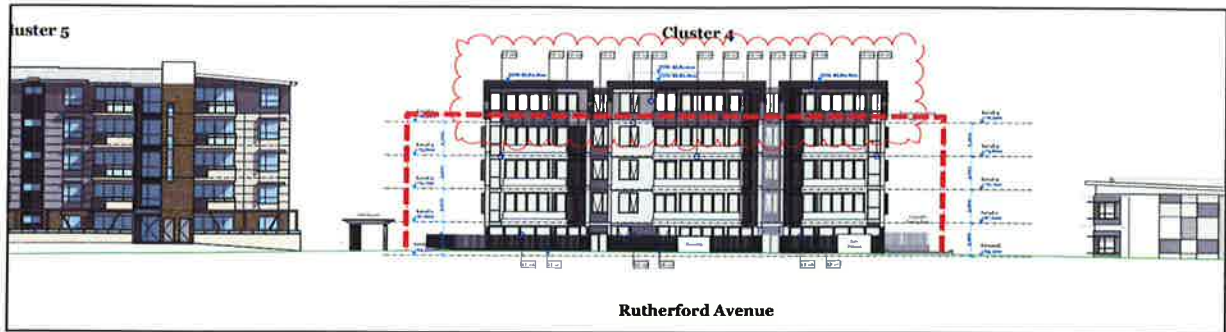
Proposed streetscape (eastern) elevation of Cluster 4 to Rutherford Avenue with outline of approved building shown in red (source: application documents)
